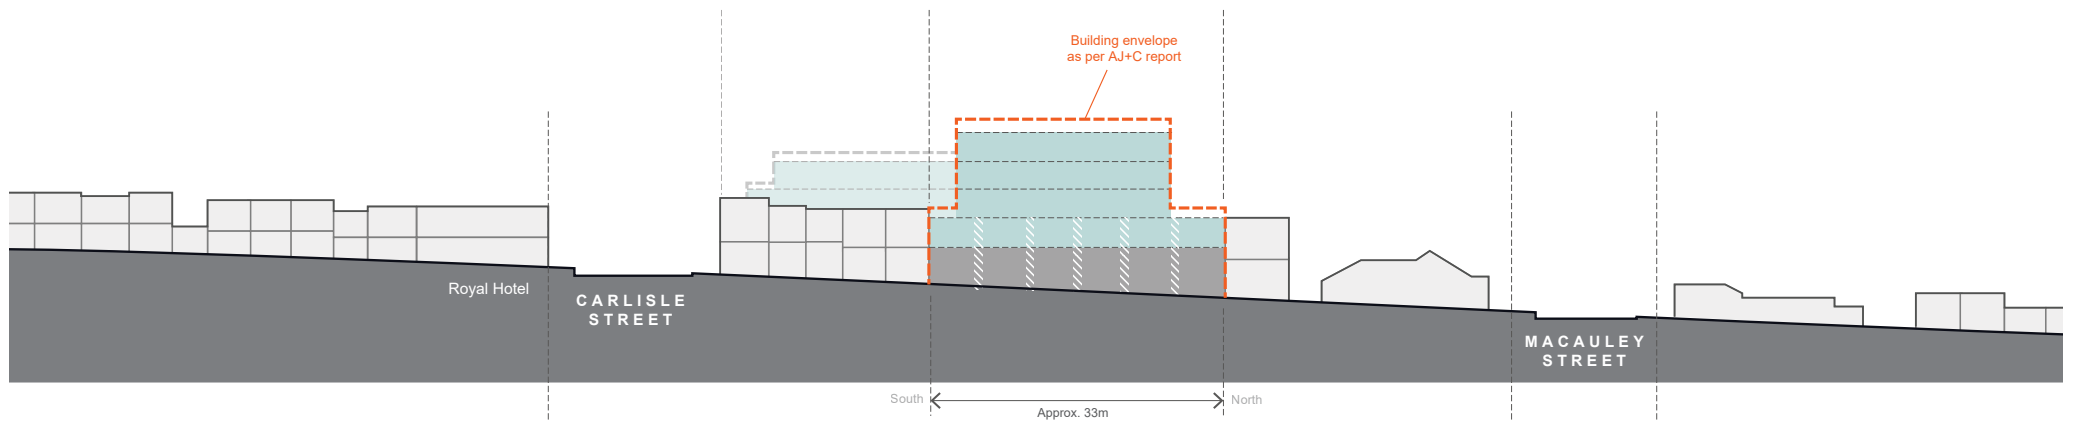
Streetscape elevation of Norton Street (AJ+C building envelope)
